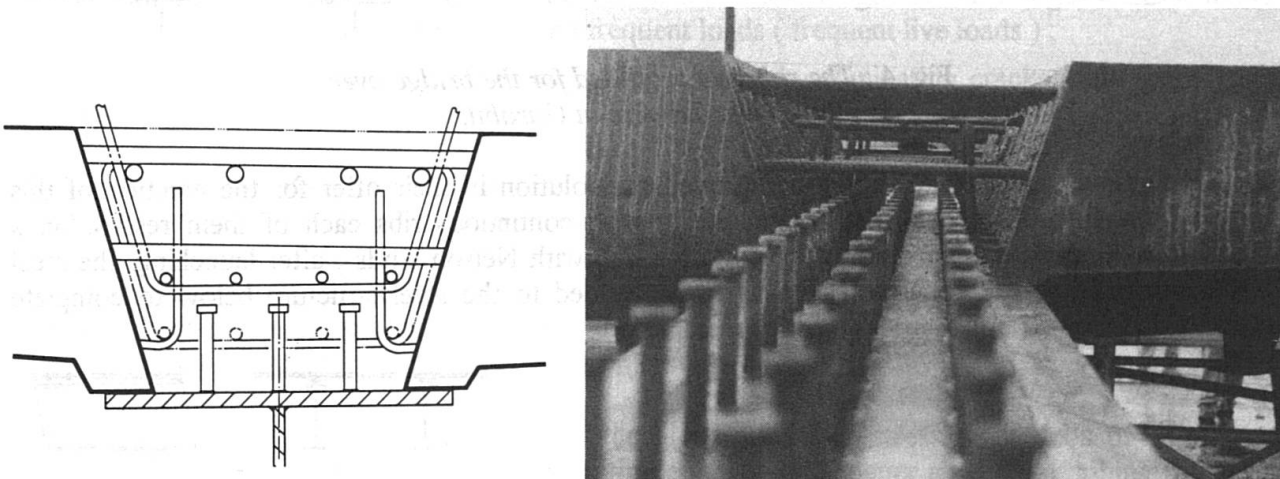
A precast concrete slab in independent elements, transversally connected by reinforcement bars.
